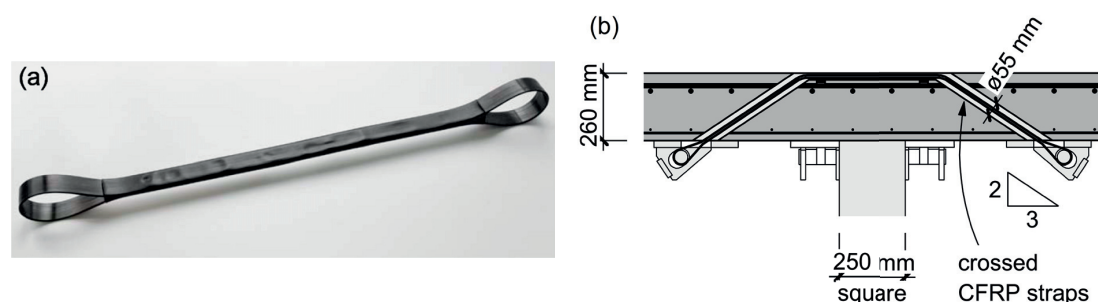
Application of non-laminated CFRP straps for punching shear strengthening of concrete slabs: a) flexible strap component; b) installed and prestressed strap [15]
